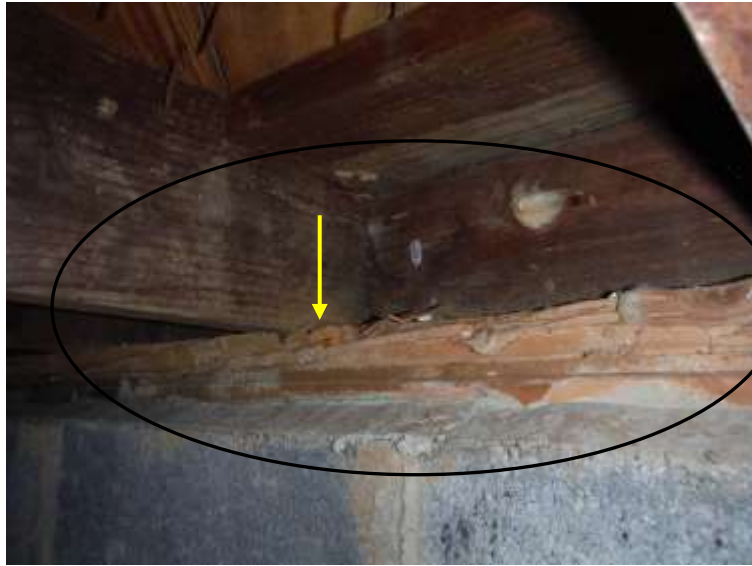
Joists compressing termite damaged sills; structural/material defects.
